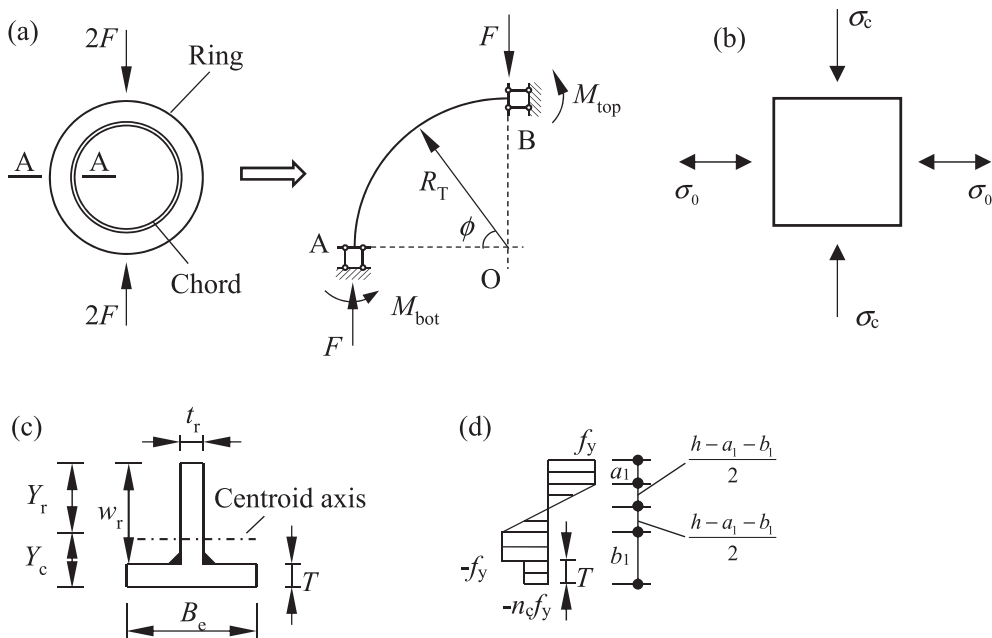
Simplified model schematic diagram. (a) Simplified curved beam for ring model; (b) chord wall element under in-plane stress state; (c) geometric parameters for T-shape section; (d) stress distribution on T-shape section.
